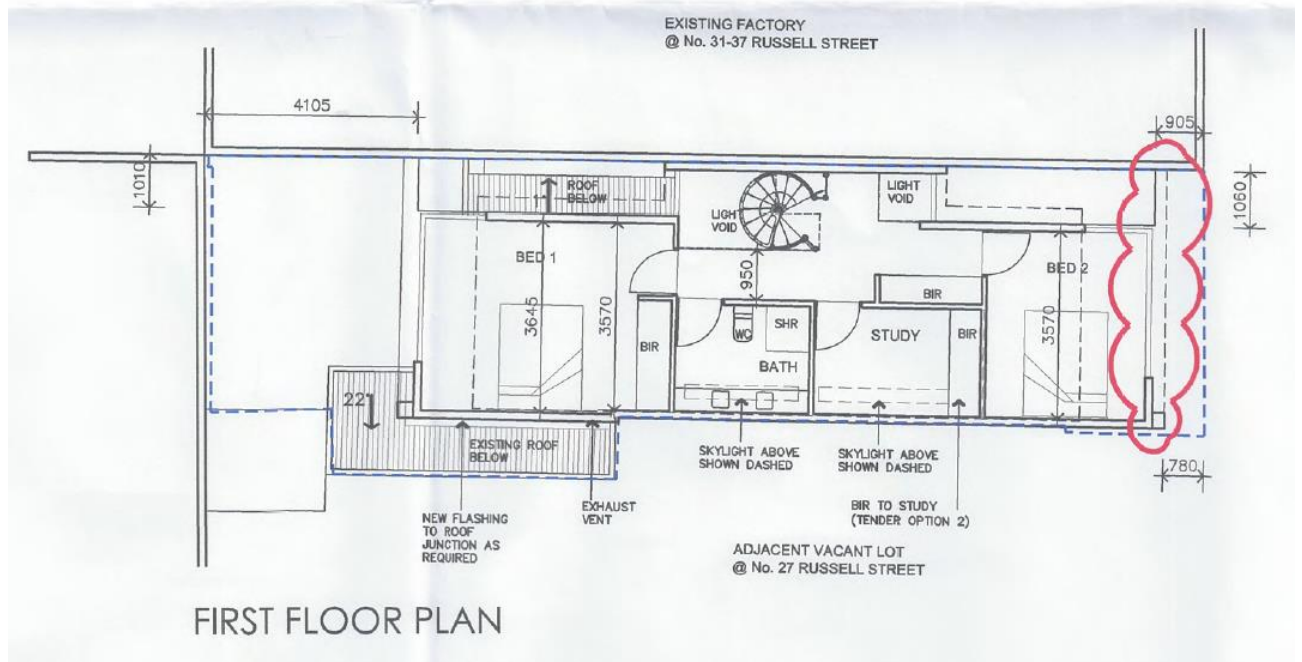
First floor plan of No. 29 Russell Street (as per plans endorsed as part of Planning Permit PLN13/0127).
